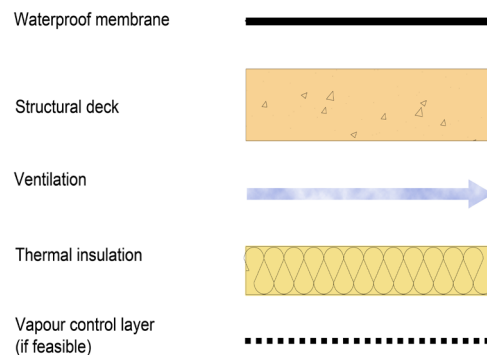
Cold roof (section) 'under ventilation' (to / from external air. Minimum height of void 50mm)
